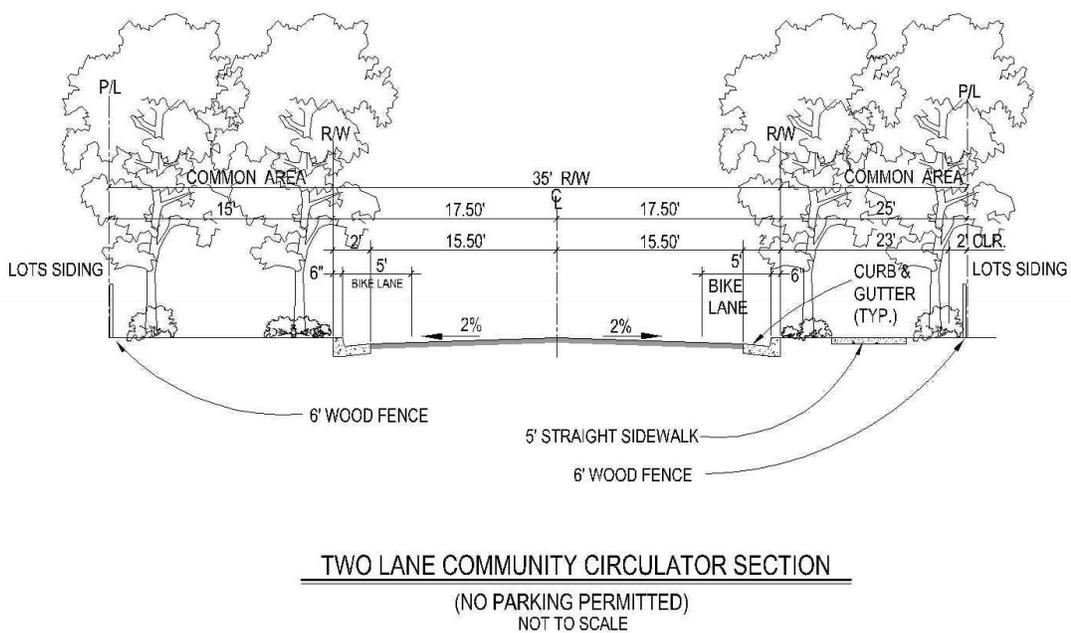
Typical Community Circulator Street Cross Section (LID Alternative)
